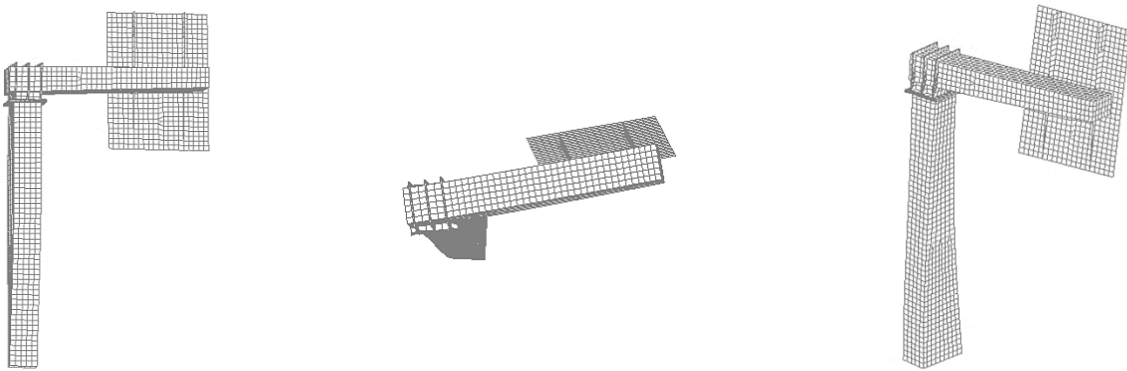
Elevation view of (a) The overall sign structure and (b) The detailed beam-column connection
